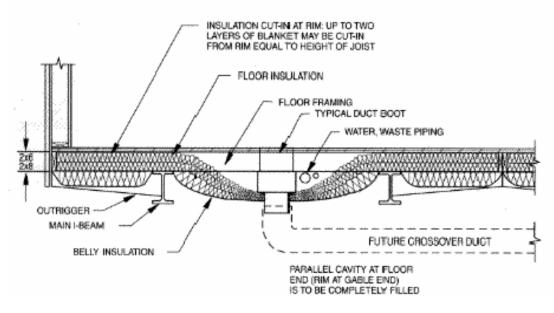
Floor and belly area with supply ducts. These ducts supply conditioned air to all rooms through floor vents, a common duct system layout in manufactured homes.
